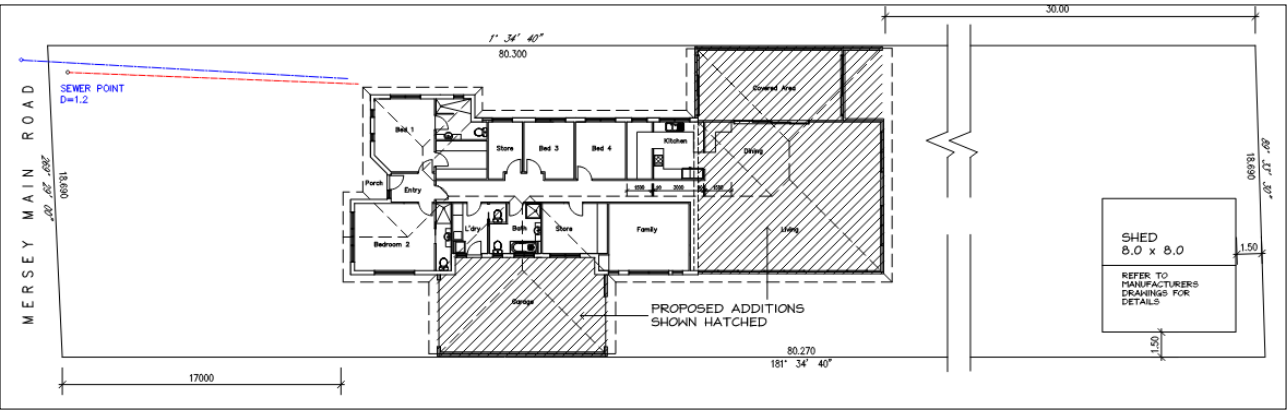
Site plan (Steven Penton Building Design, 2022)
